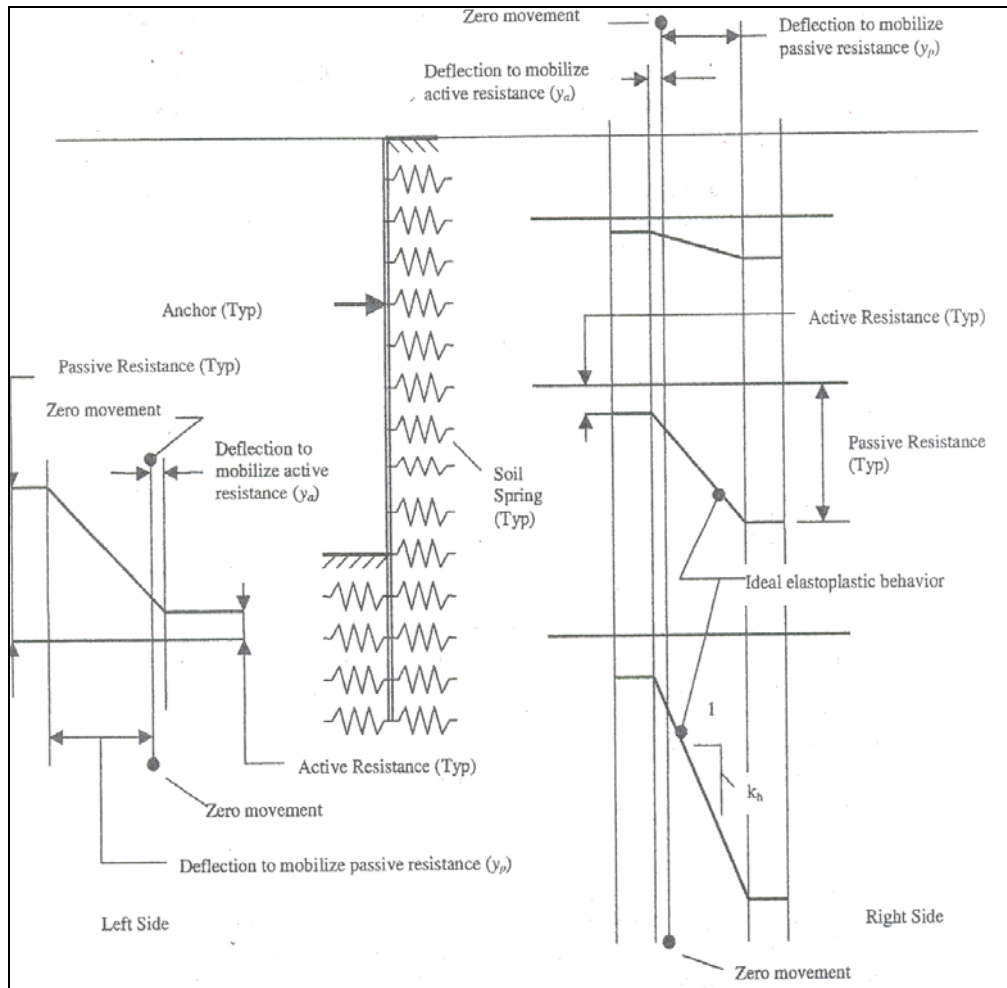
Tieback wall soil springs for Winkler analysis (Strom and Ebelling,2001)
